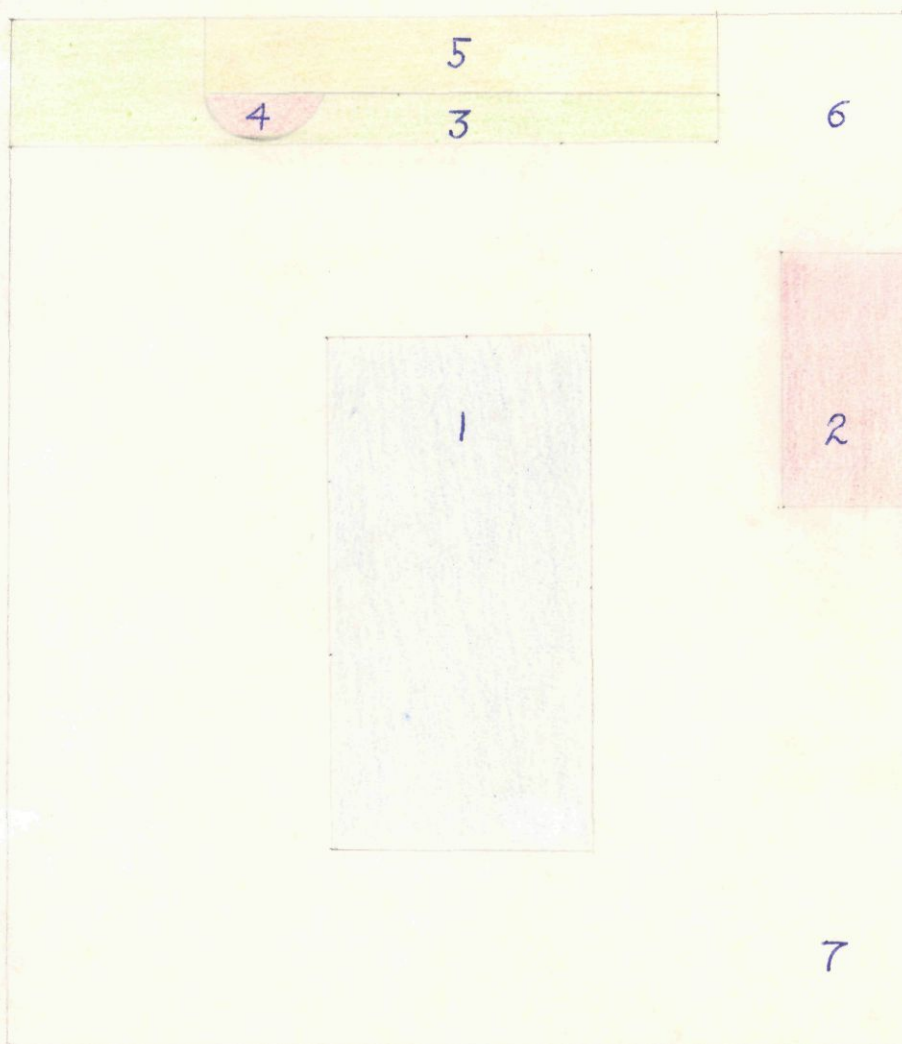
A - Plan View of Lab Scale 1" = 3 ft.
